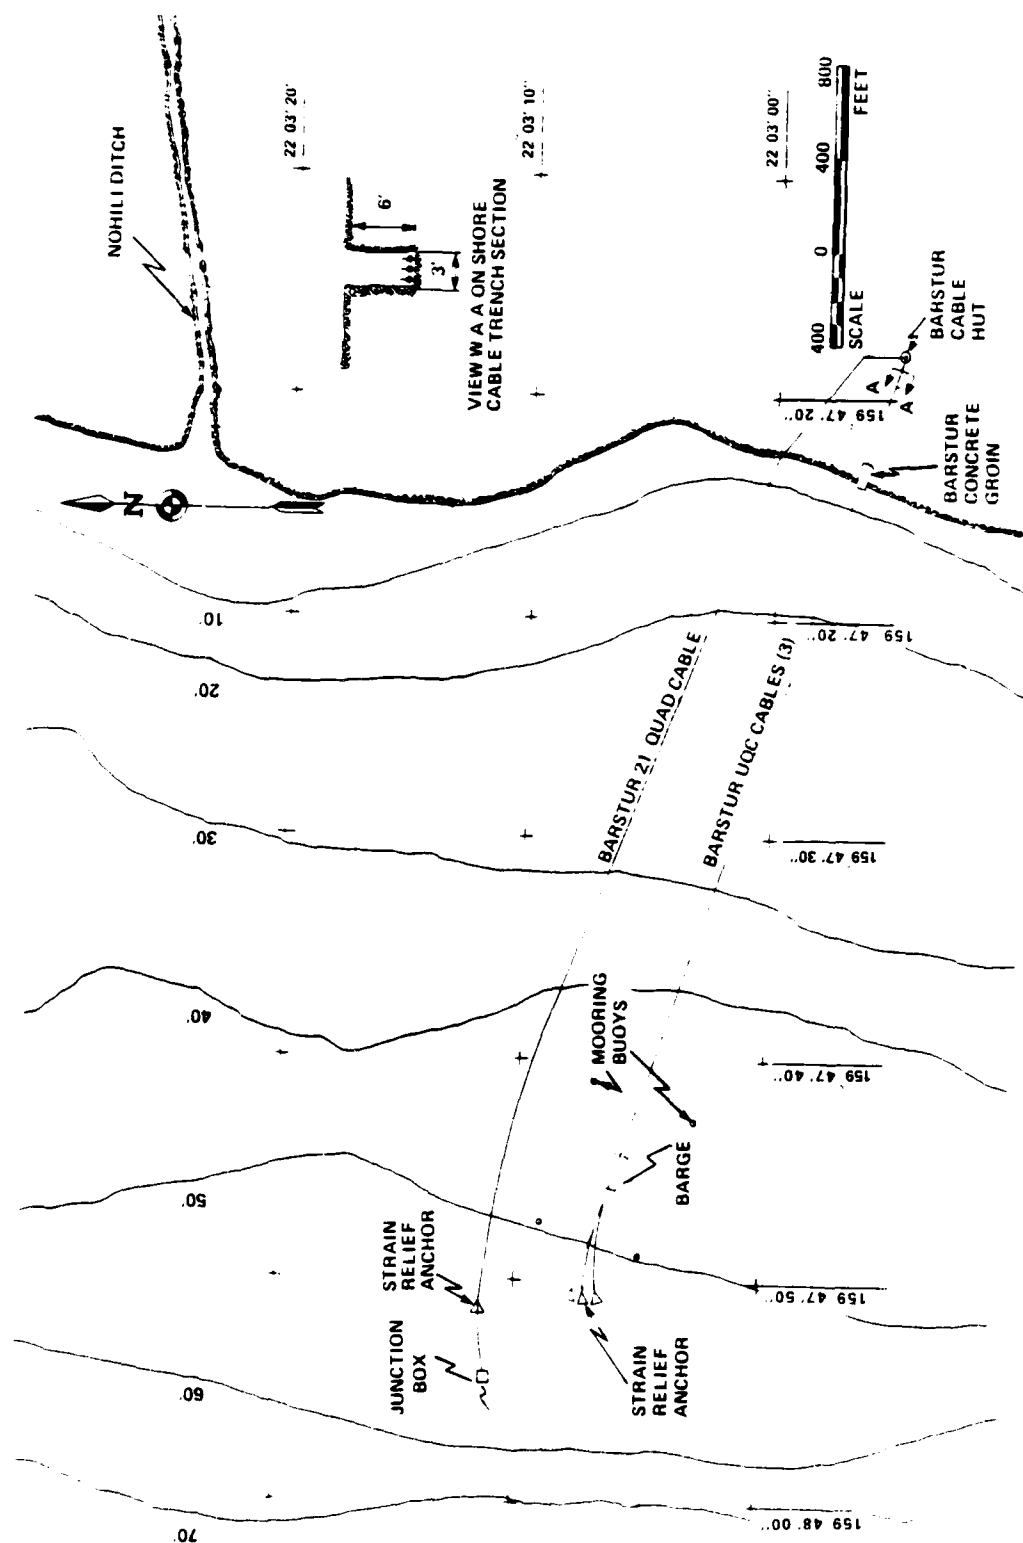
BARSTUR UQC Cable Repair 4 Point Moor and Inshore Cable Layout
